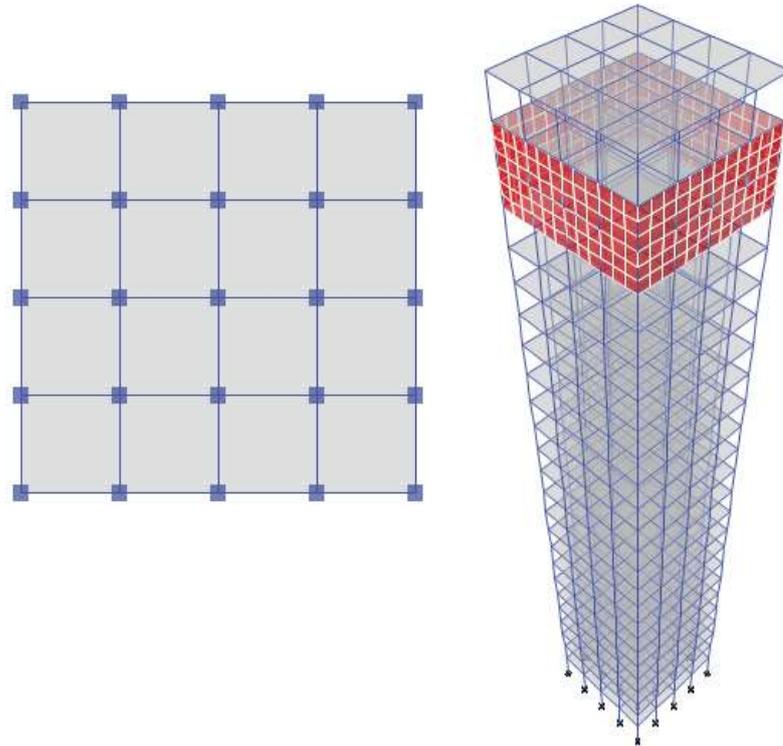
Building with External shear walls at 23rd & 24th Storey (Model III)
